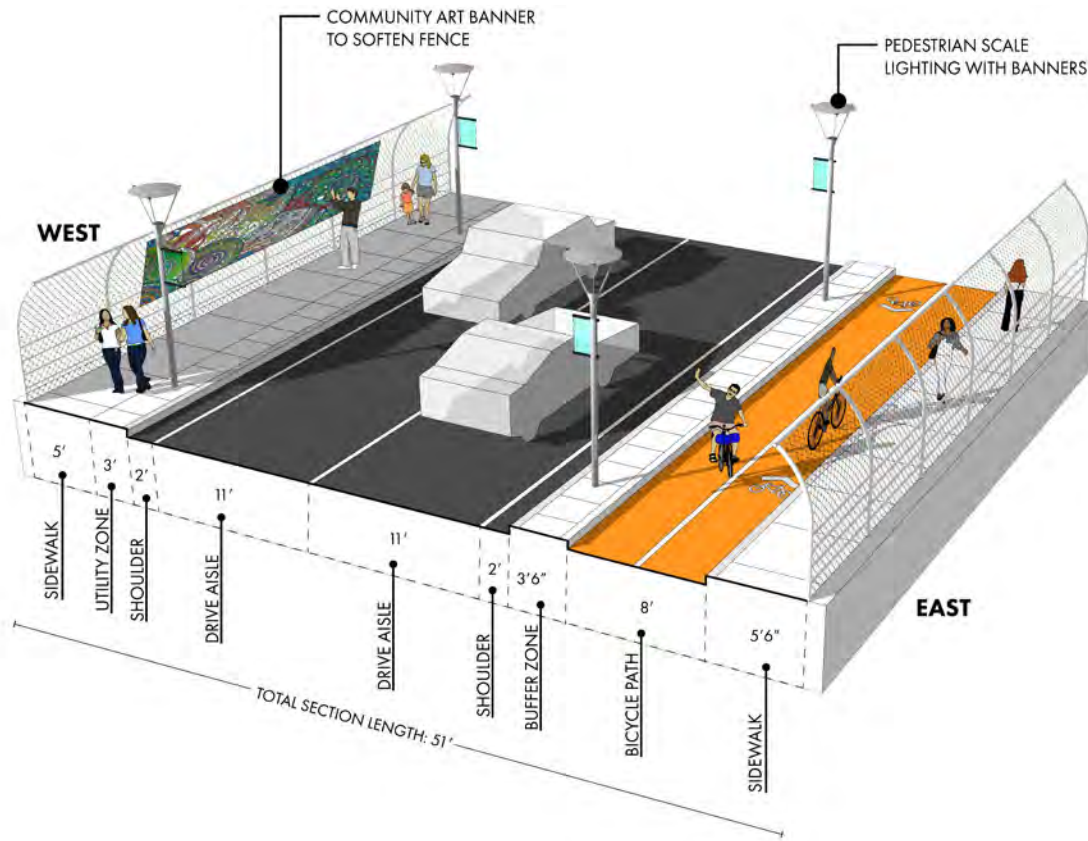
The Proposed Bridge Streetscape Improvements Cross-Section includes narrowing drive aisles, widening sidewalks, adding a separated bike path, incorporating better lighting, and community art along the fence.
